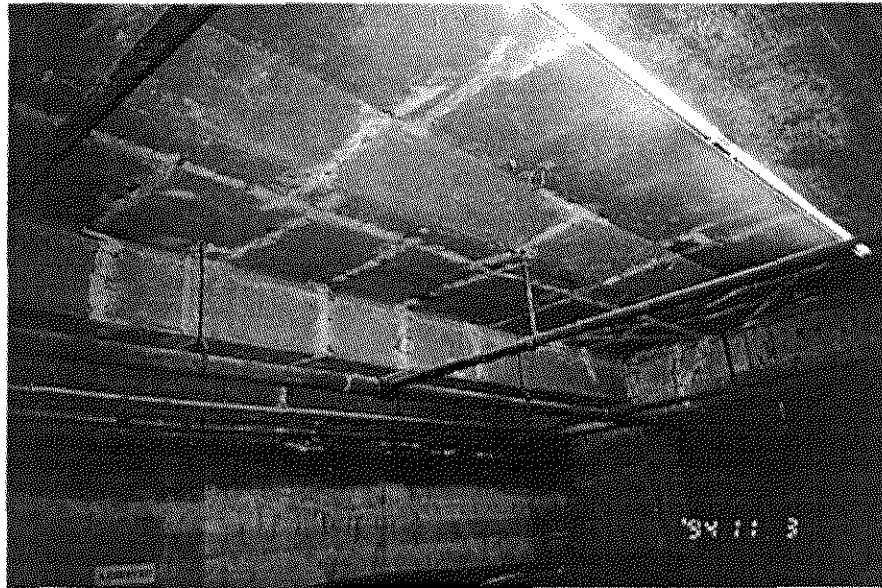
Epoxy repaired cracks on slab and beam (Naiem, 2000)
